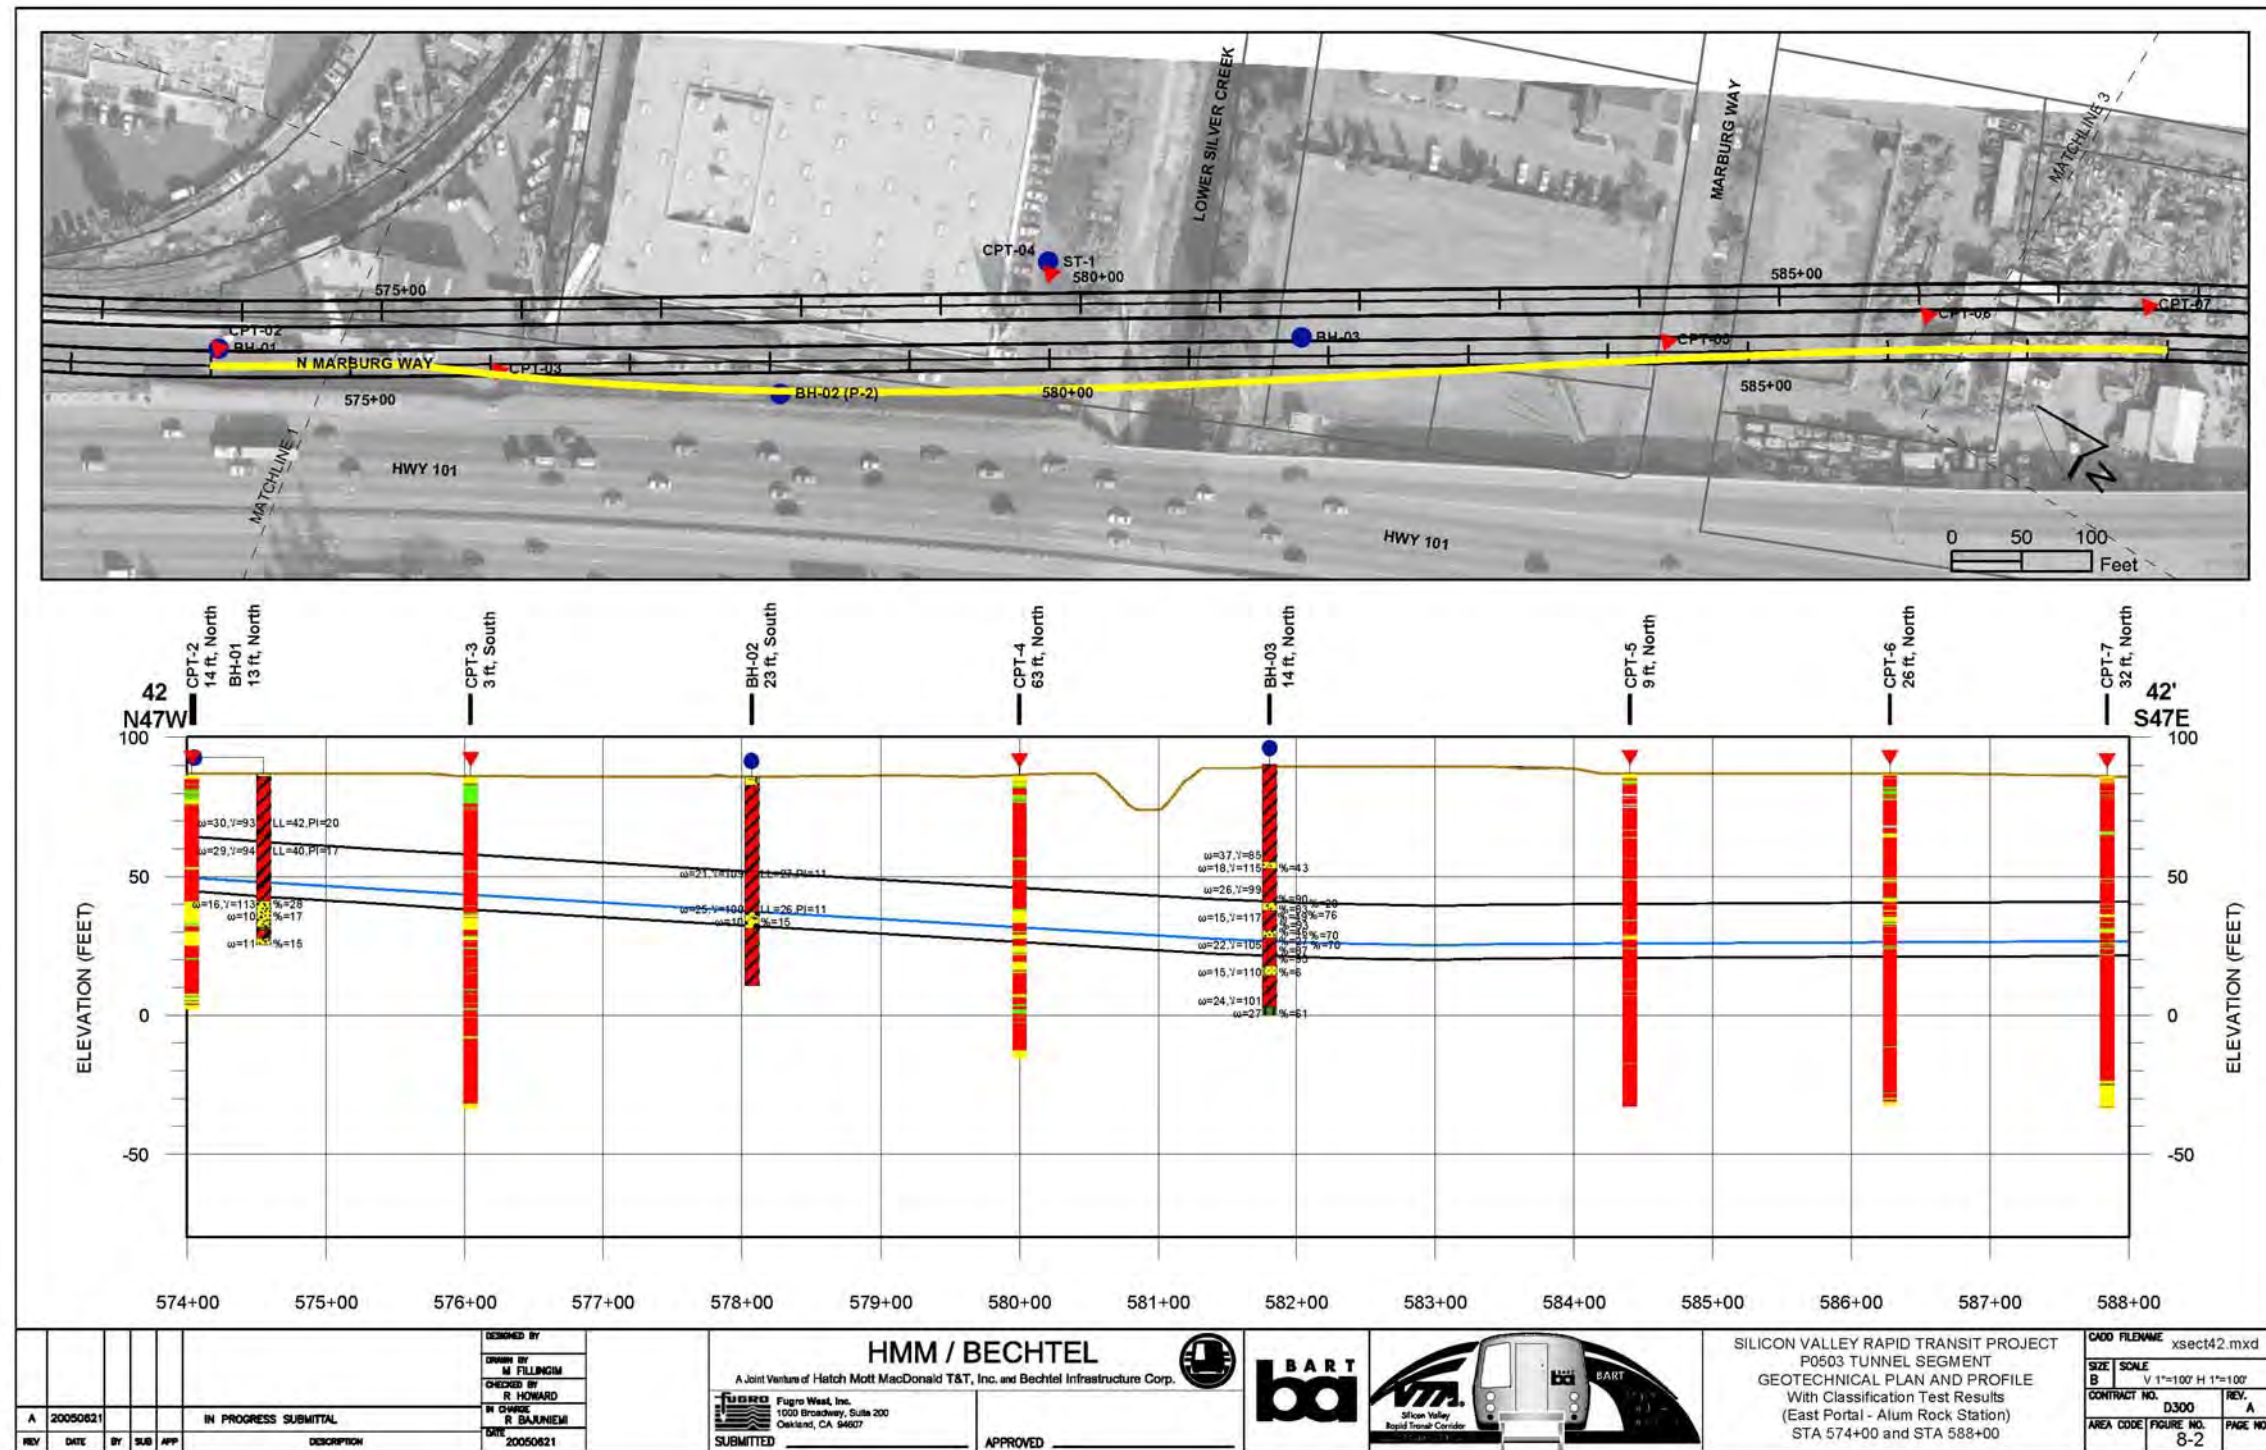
Geotechnical Plan and Profile with Classification Test Results: Station 574+00 to 588+00.
